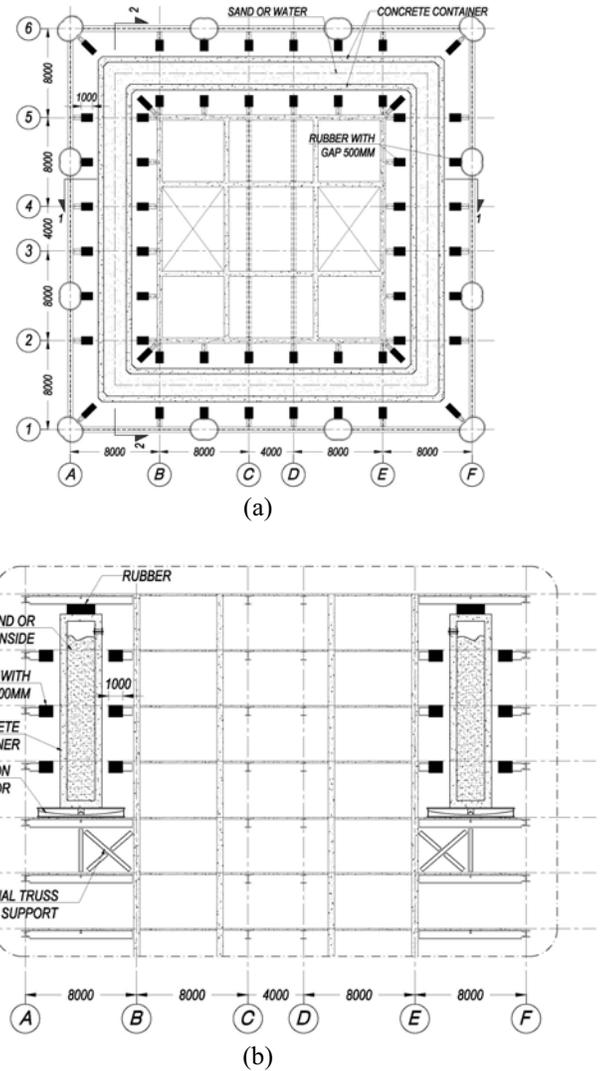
First TMD unit: (a) plan view at story 69 to 71, (b) cross section 1-1. All dimensions are in mm.
